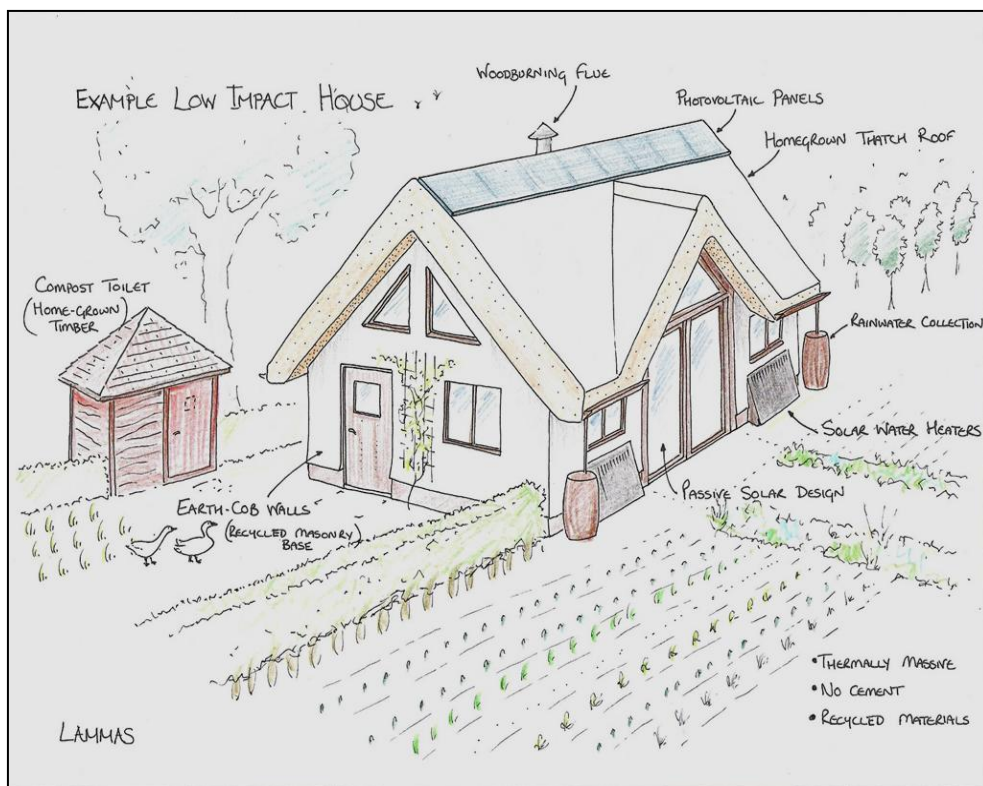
Drawing of one possible model of a low impact home. (Drawing: courtesy of Paul Wimbush)
